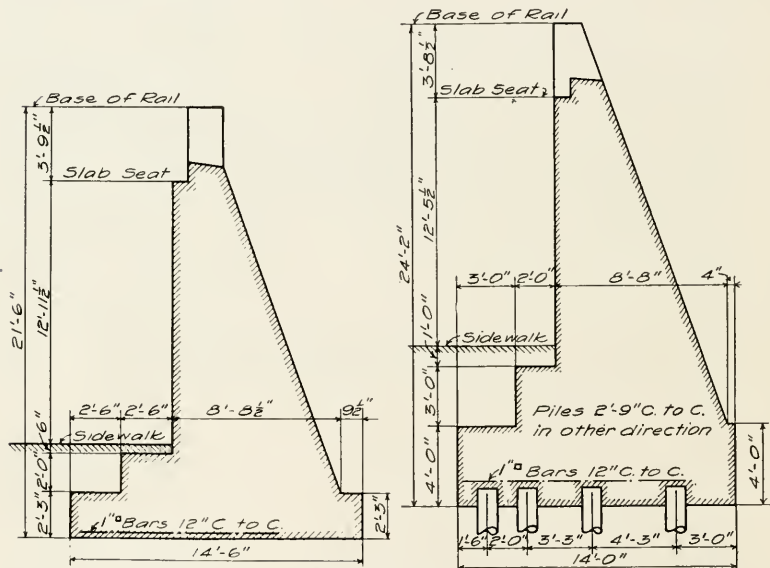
is a cross section of the north abutment at the Chicago Avenue Subway. This abutment is 21 feet 6 inches high from base of rail to bottom of footing, and has a base of 14 feet 6 inches, making a ratio of base to the height of .67. The footing has a toe projection of 5 feet, reinforced by 1-inch bars. The step is added to keep the unit shear low and make shear reinforcement unnecessary. Fig. 9 is a cross section of the north abutment at Church Street, which is on piles. The rows of piles are spaced in such a manner that the load on the extreme front row will never exceed the allowable bearing
